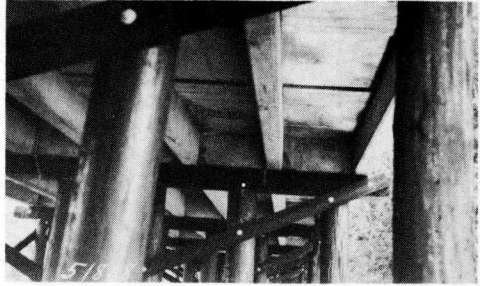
Baker River Bridge - View Looking Up Under the Deck
